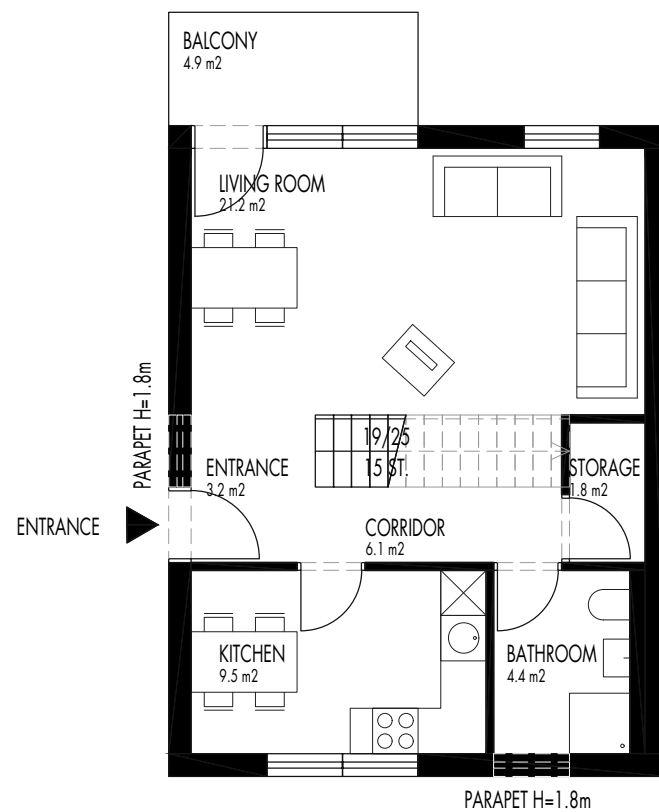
Floor Plan of Residential and Multipurpose Units - Maisonette 1
